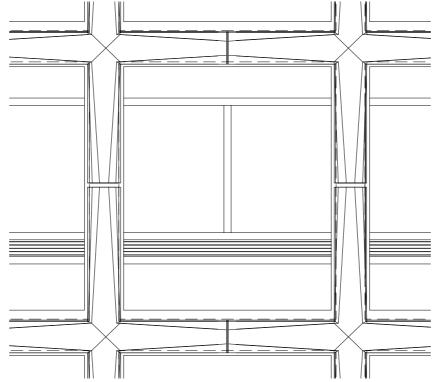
S73 Consented Tower Fixed Window Unit
